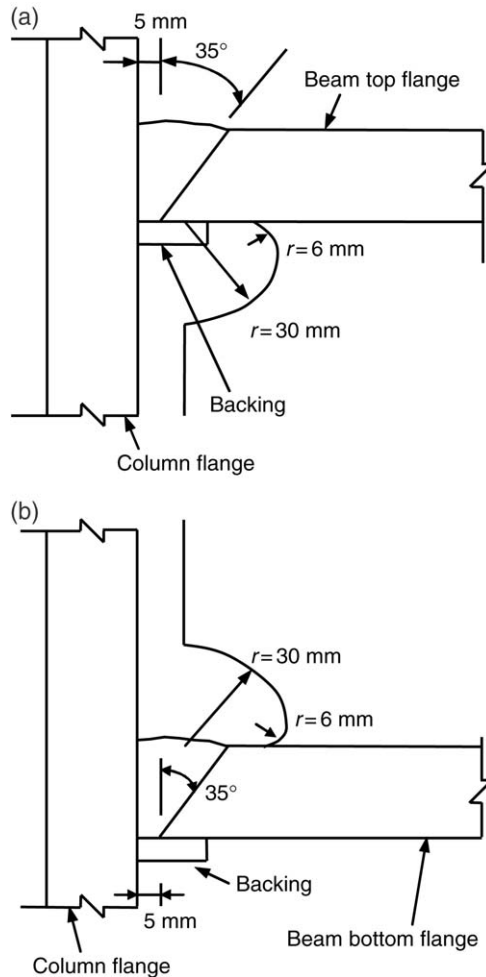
Details of the weld access hole and groove weld: (a) top flange; (b) bottom flange.
